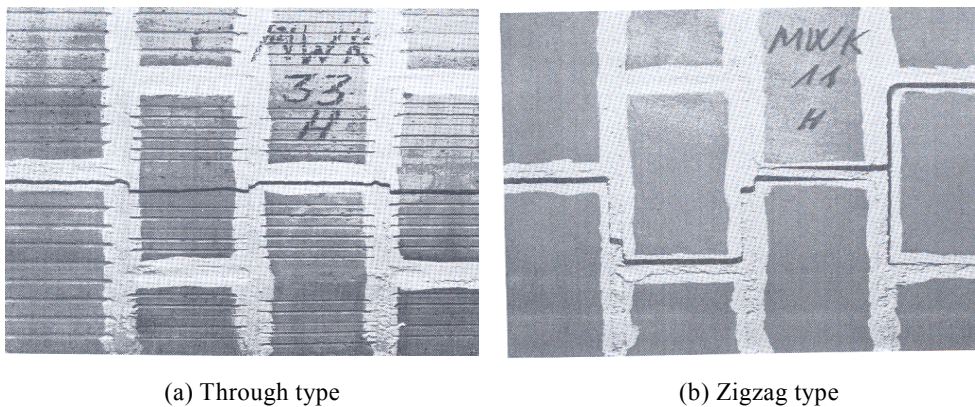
Modes of tension failure of masonry walls under direct tension (Backes (1985))
